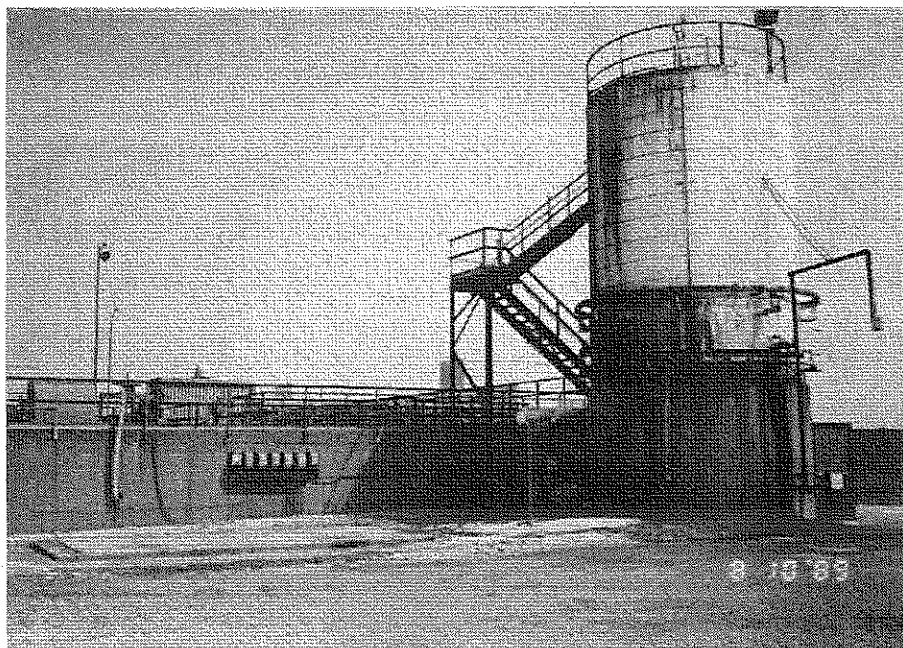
Southeast view of Waste Pickle Liquor Sump (SWMU 39). Note stains on concrete walls and surrounding area. In background, empty phosphate product tank. (Photographs 1-38 and 2-1 are identical to Photograph 1-37.)
